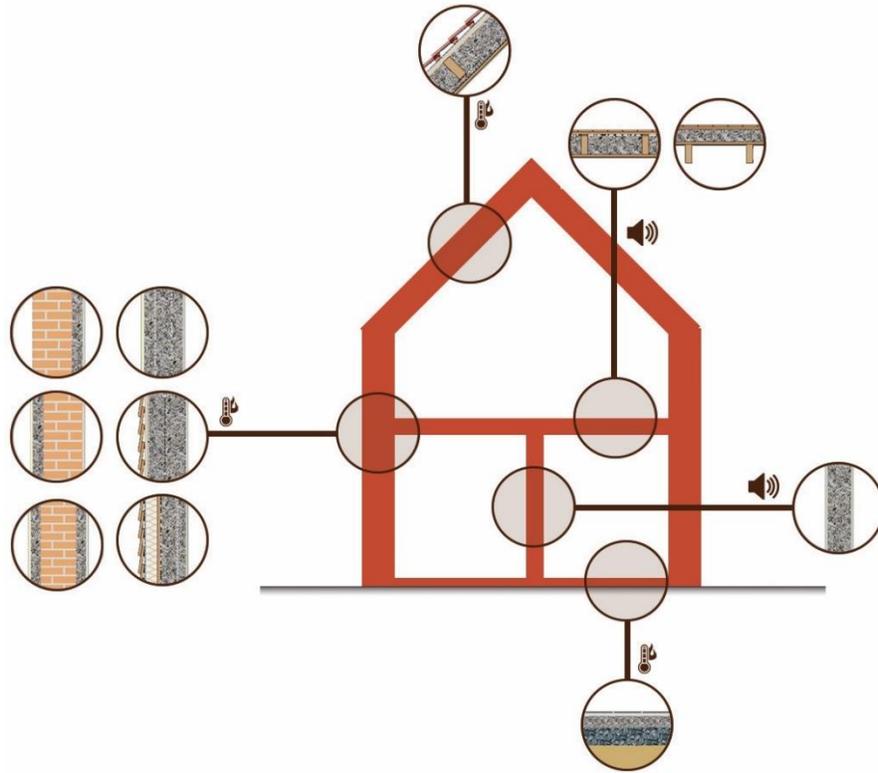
Implementations of hempcrete on buildings and its use, Image by author, Adapted from: (Evrard & Zurich, 2008)
